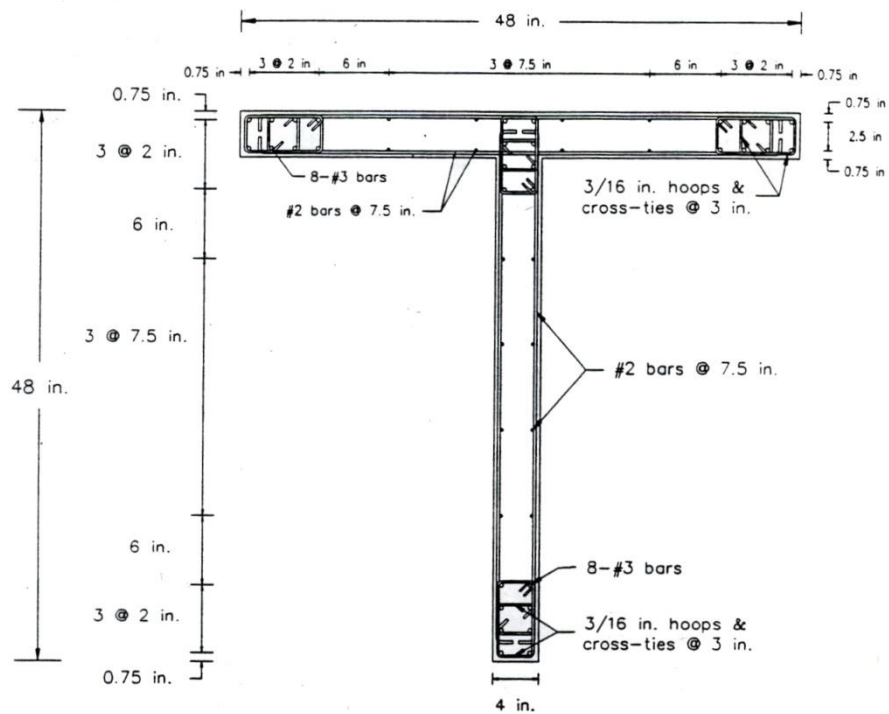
Wall Section TW1 Tested by Thomsen and Wallace [1995]
